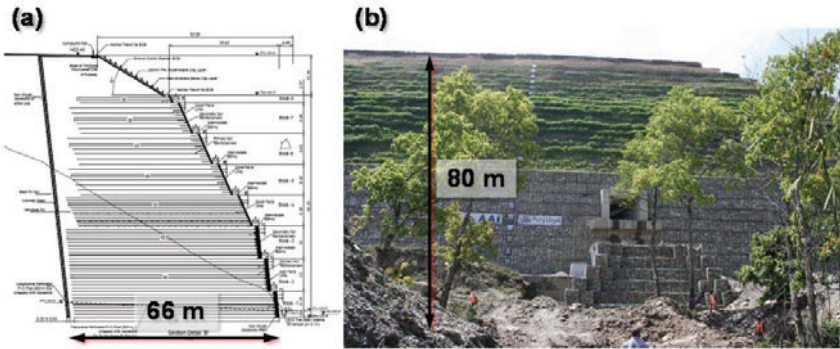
High (80 m) geosynthetic-reinforced wall constructed for the Sikkim Airport: a) Cross-section, b) Front view (Zannoni 2011)
